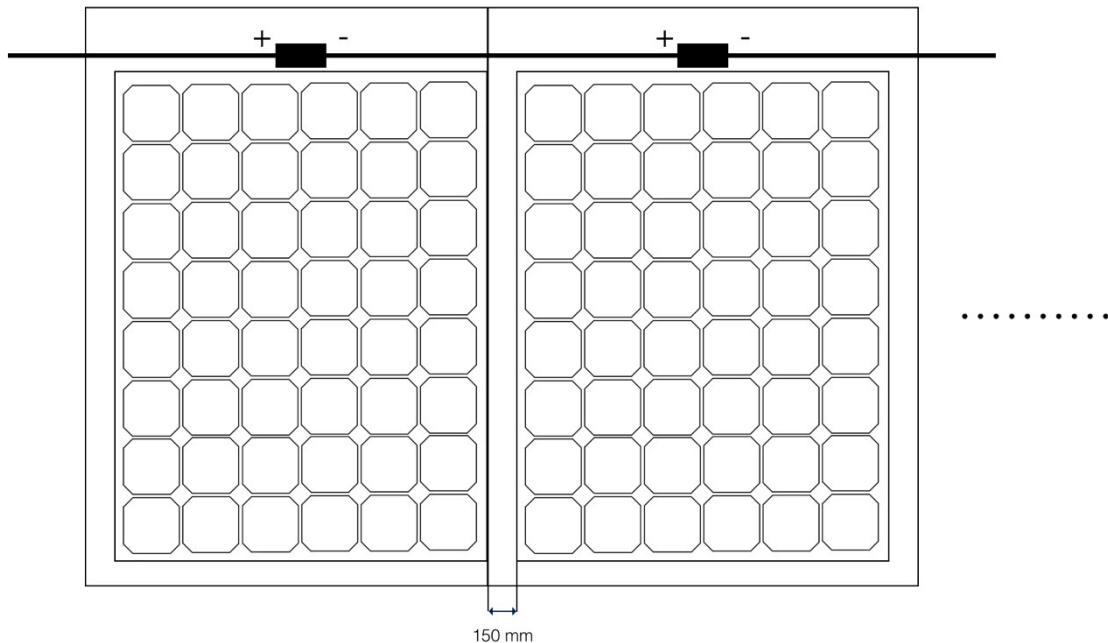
Welding multiple solar panels on to roofing membrane or other membrane surface
